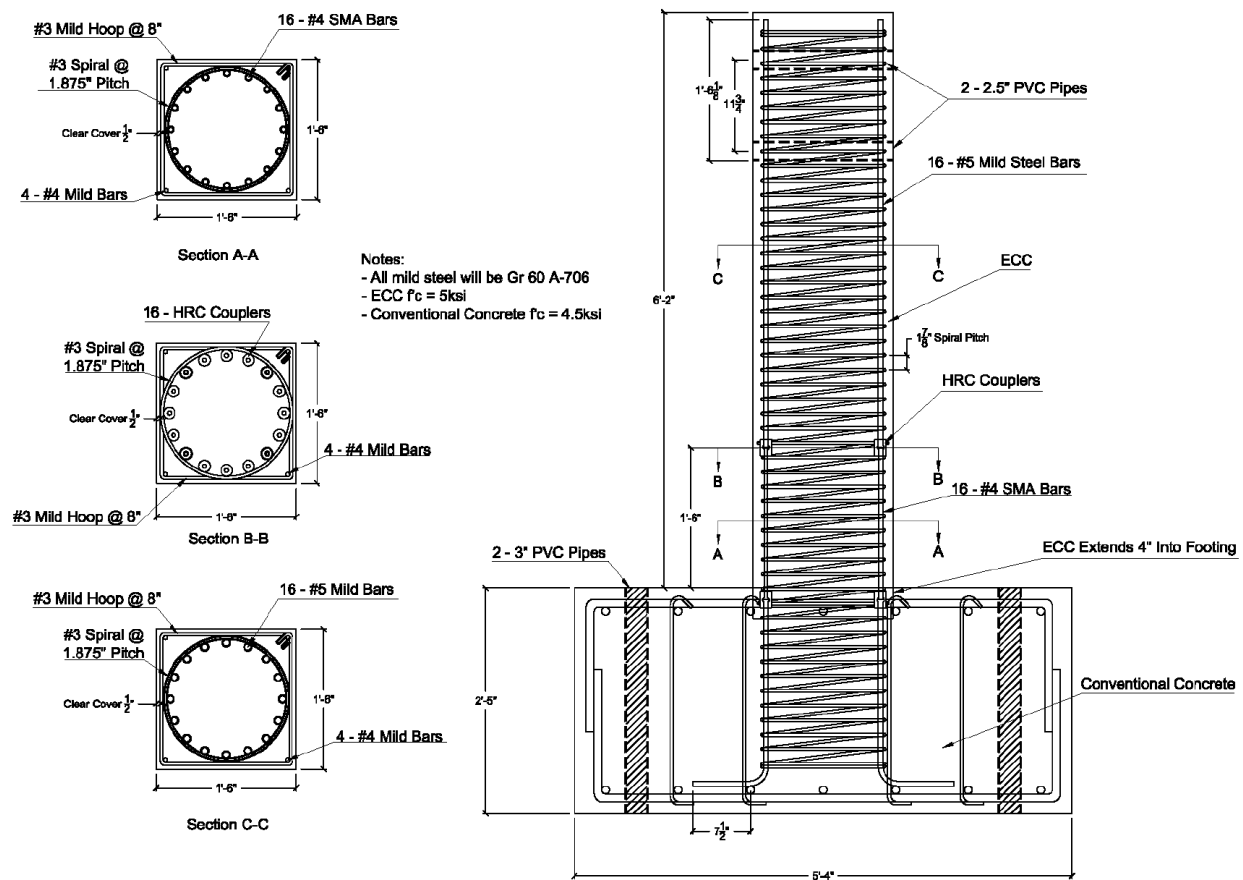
Reinforcement detailing of a 30% scale Nitinol-reinforced bridge pier column specimen (adapted from Nakashoji, 2014).
